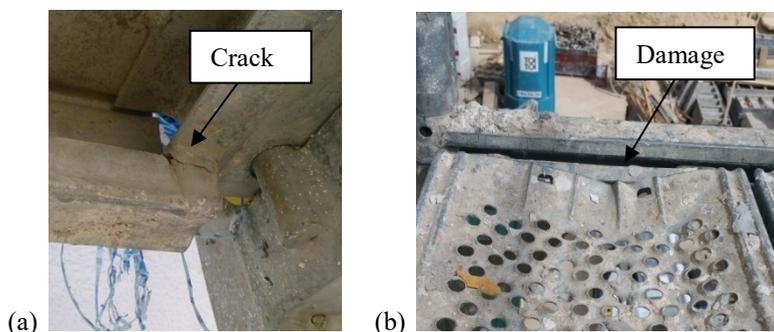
Damage of steel decks in support zones: (a) weld crack, (b) deformation of a perforated steel sheet.
